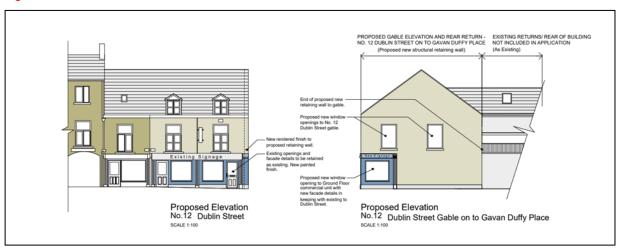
Proposed Elevation on the new gable of No 12/13 Dublin Street (Mr Malik Kebab)
